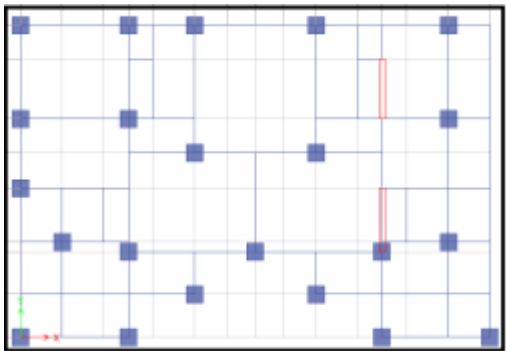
Plan showing structure with two shear wall parallel to Y- axis
